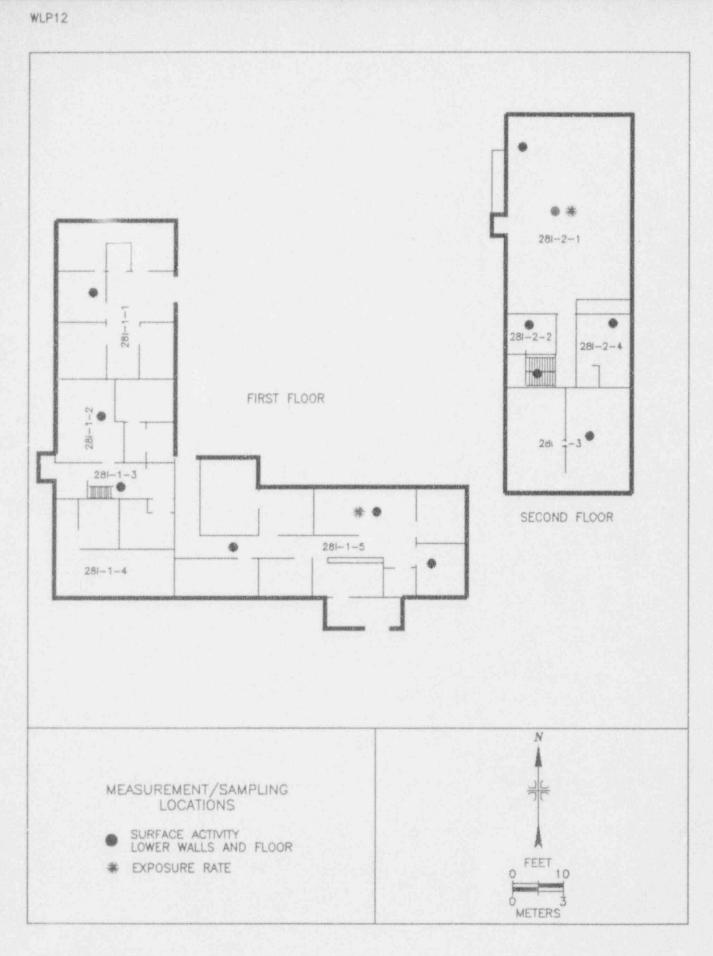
Building 11, First and Second Floors - Measurement and Sampling Locations
